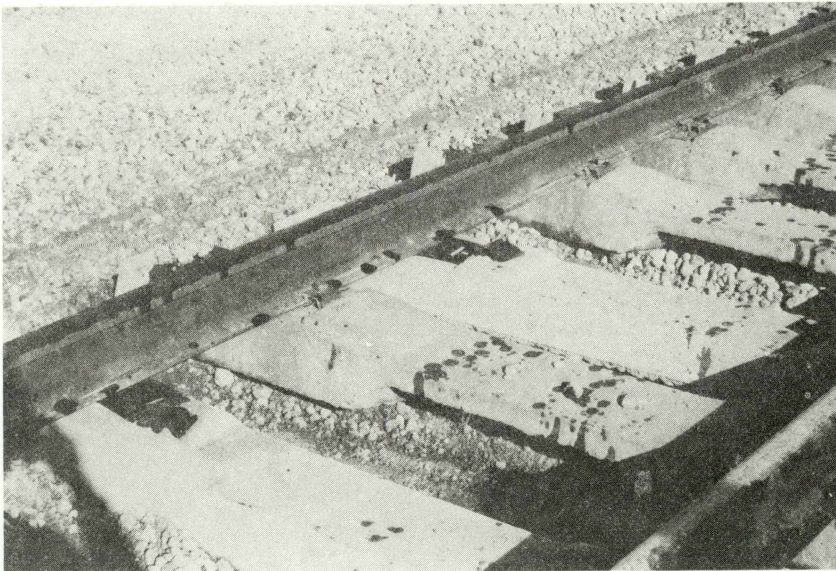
Some early ties had a wedge shaped center section in an attempt to reduce or avoid center binding. Wedge section ties were more susceptible to torsional failures and are replaced with ties having a trapezoidal center section. (2)
